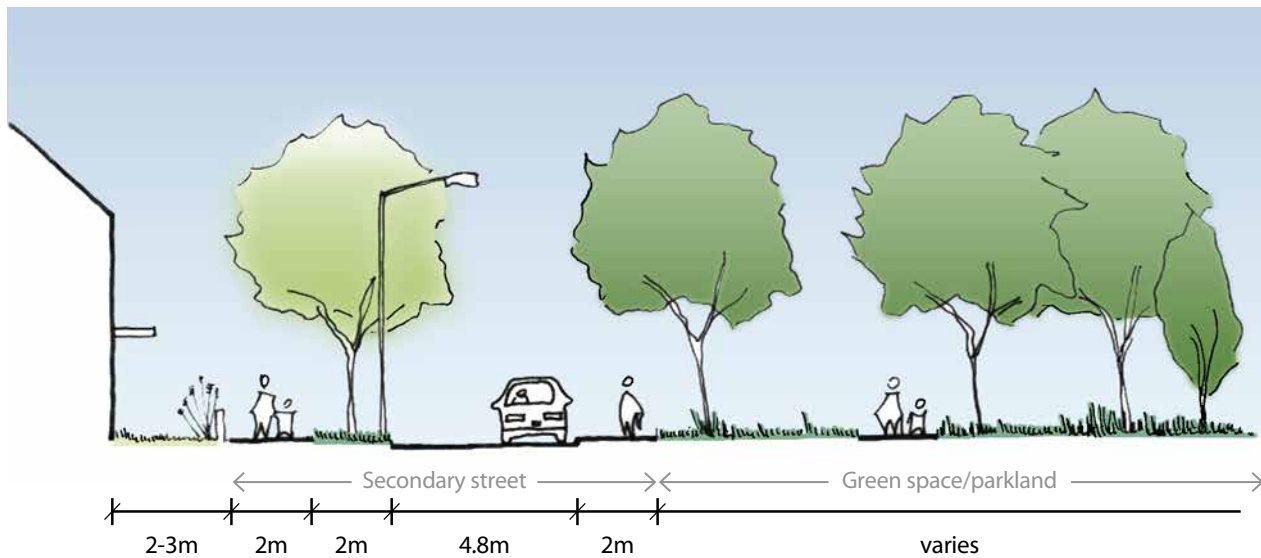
C-C – typical secondary street cross section (refer to Fig. 18 for section location)
